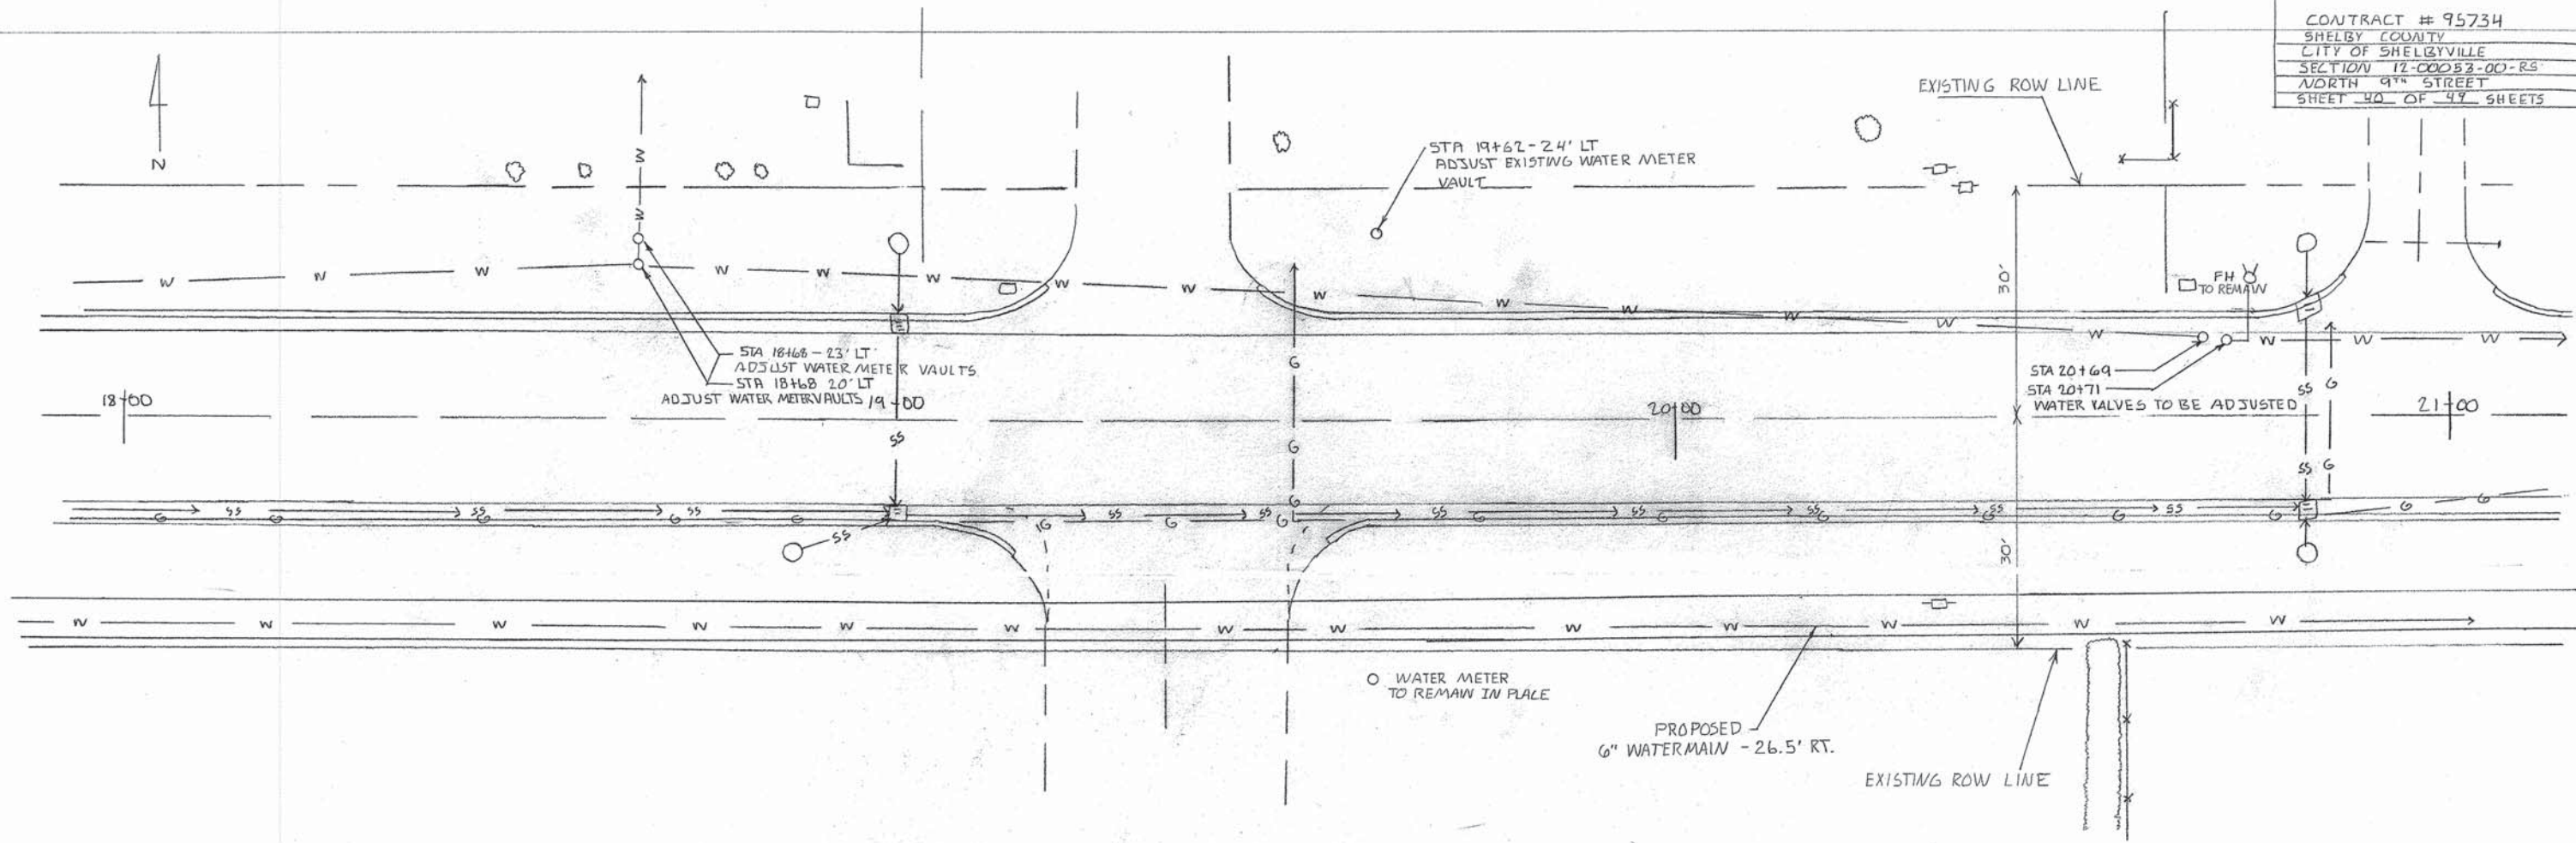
SINGLE PLAN AND PROFILE-FULL LINE
